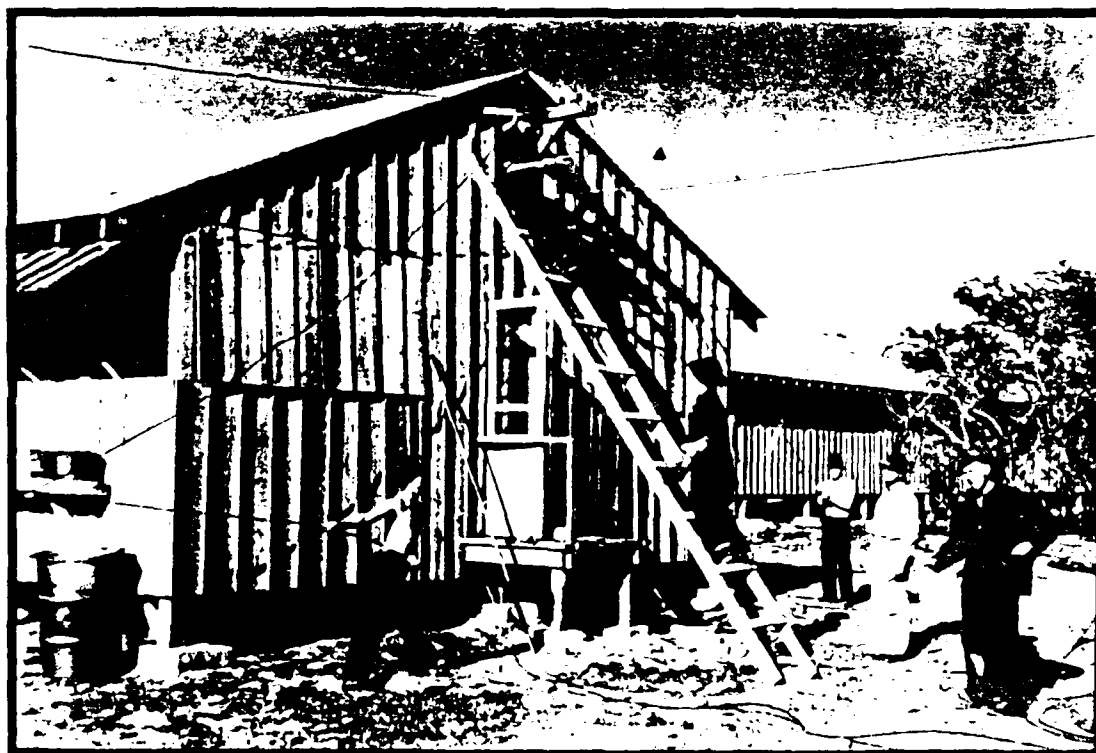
WIRING THE BARRACKS, CAMP MALAKOLE
